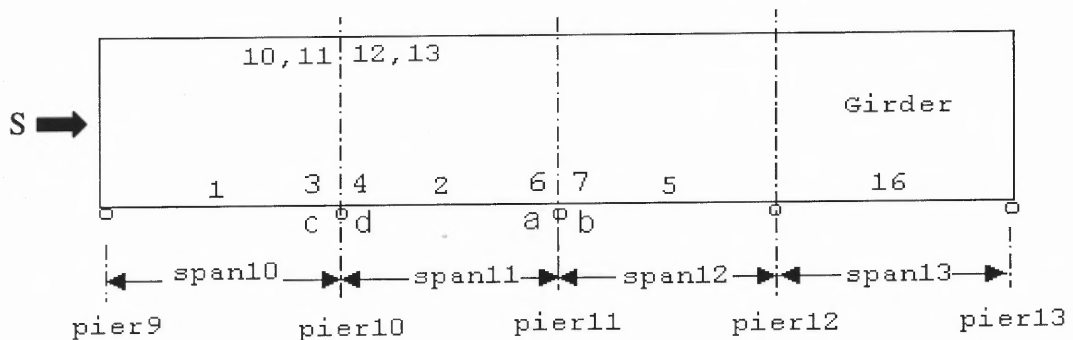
Instrumentation layout of Rt. 1&9 tests (Elevation).
